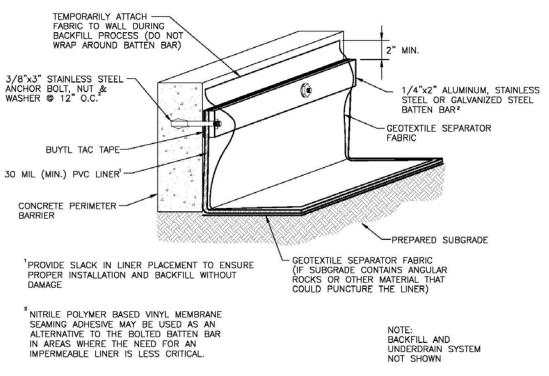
Geomembrane Liner/Concrete Connection Detail
